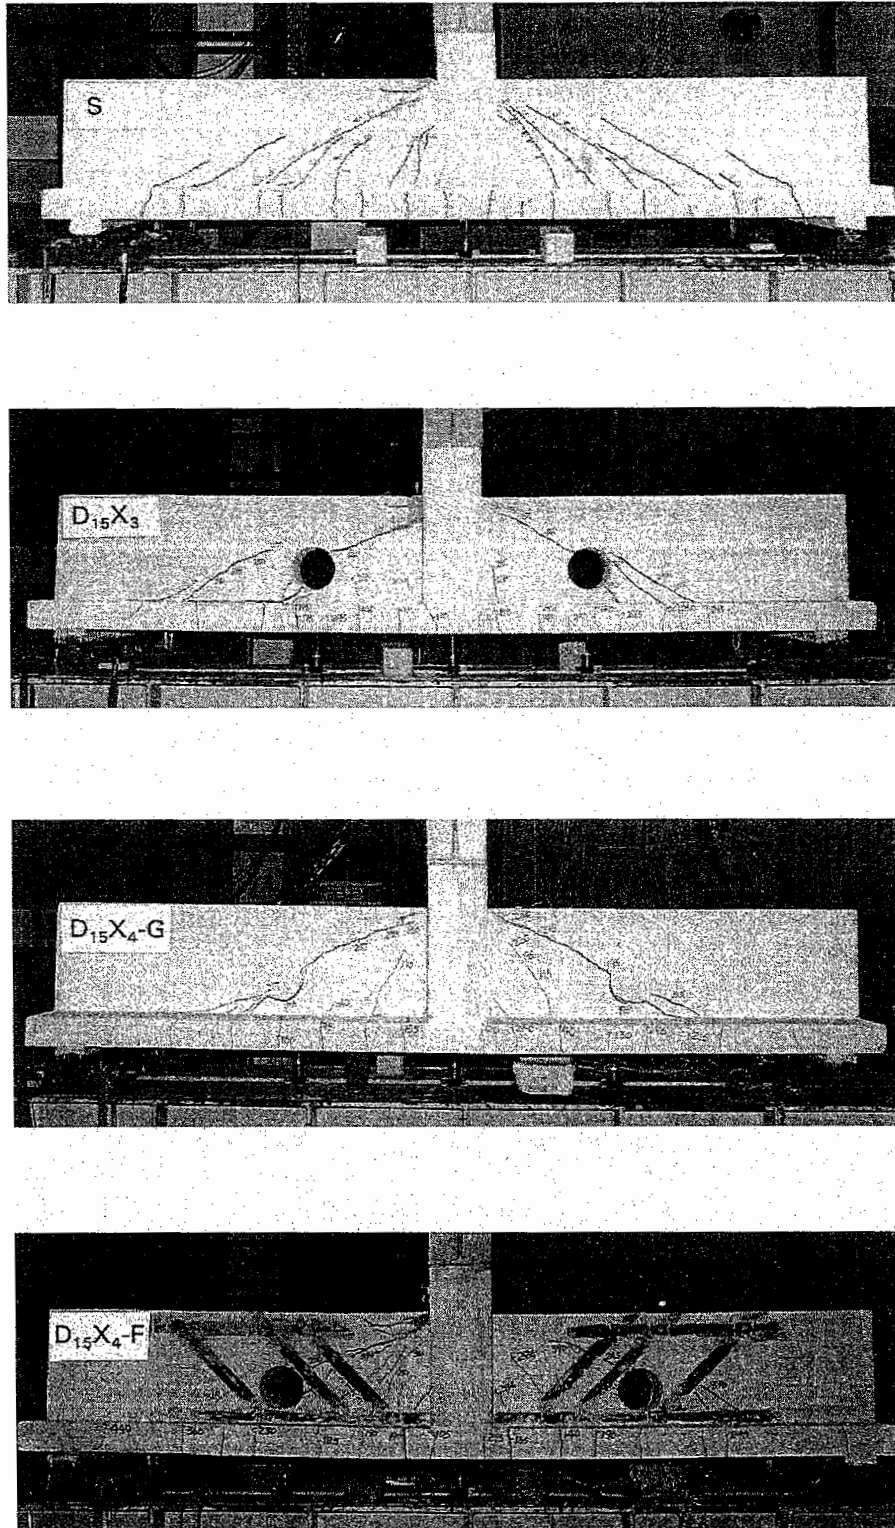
Cracking patterns of some typical beams (Weng, 1998).
